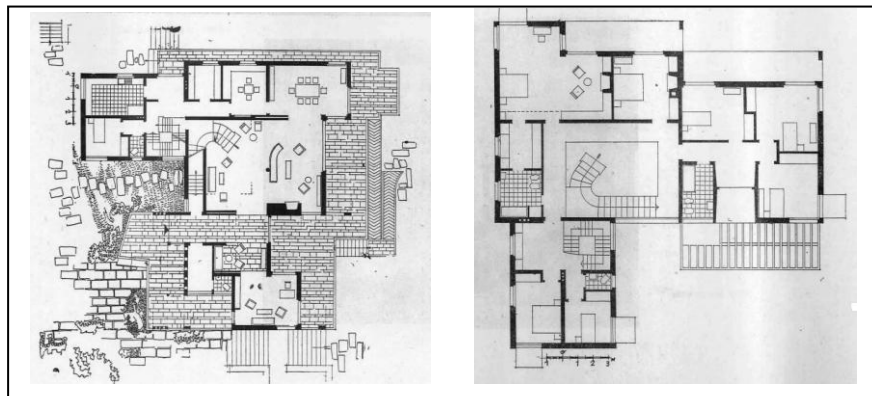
Floor plans of Sadıkoğlu villas [83]
